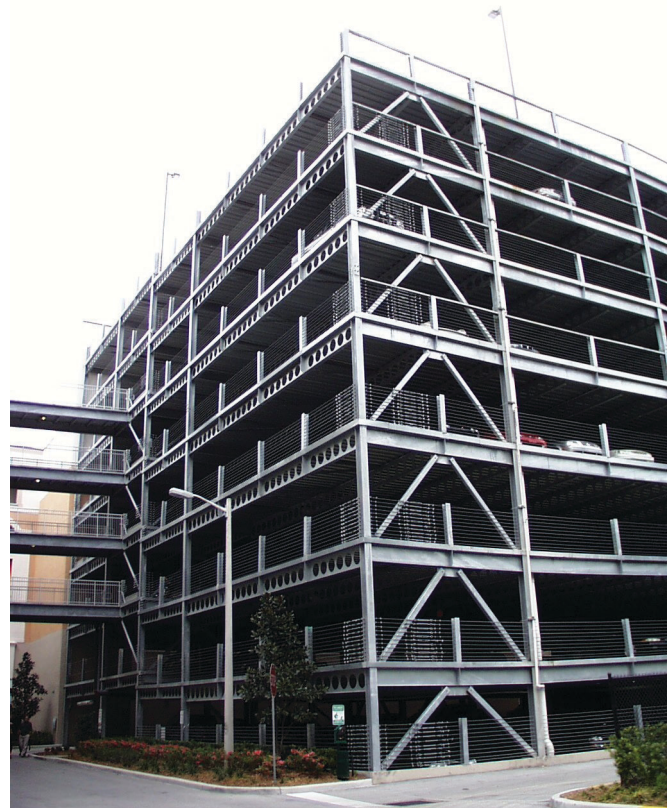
Exterior of parking garage utilizing cellular beams.
